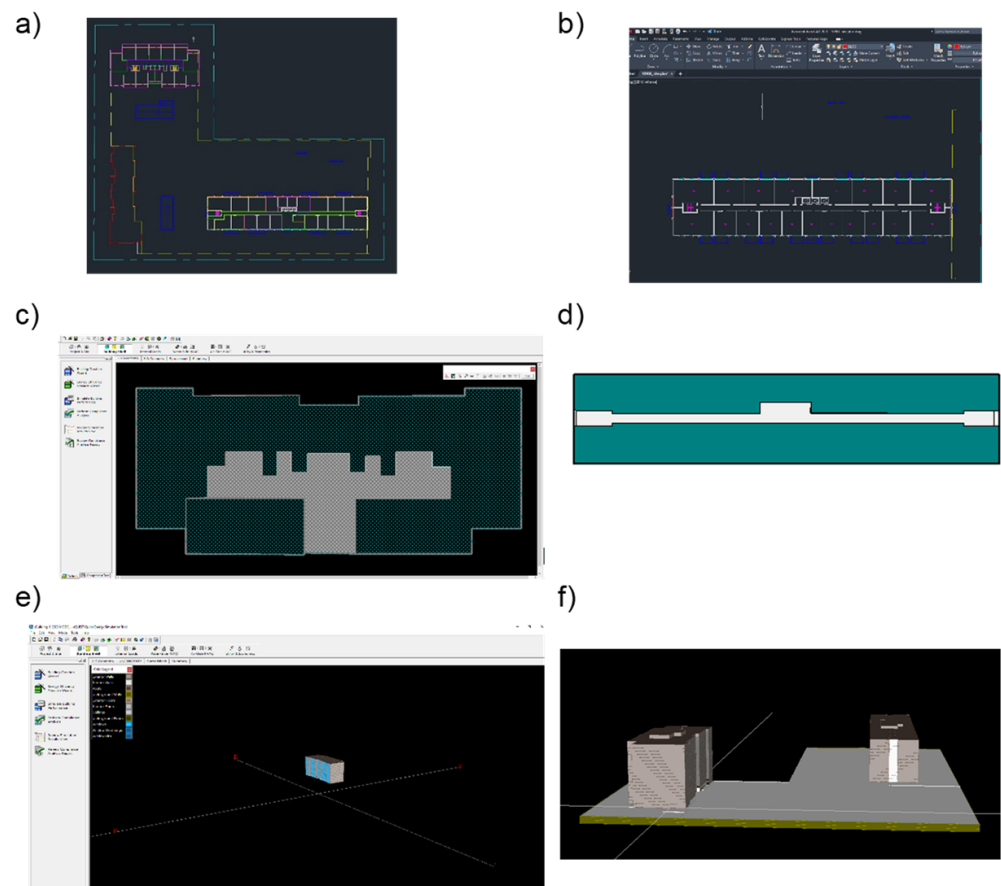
(a,b) CAD shows layout of the two buildings; (c,d) building zones; (e,f) e-Quest building models.
